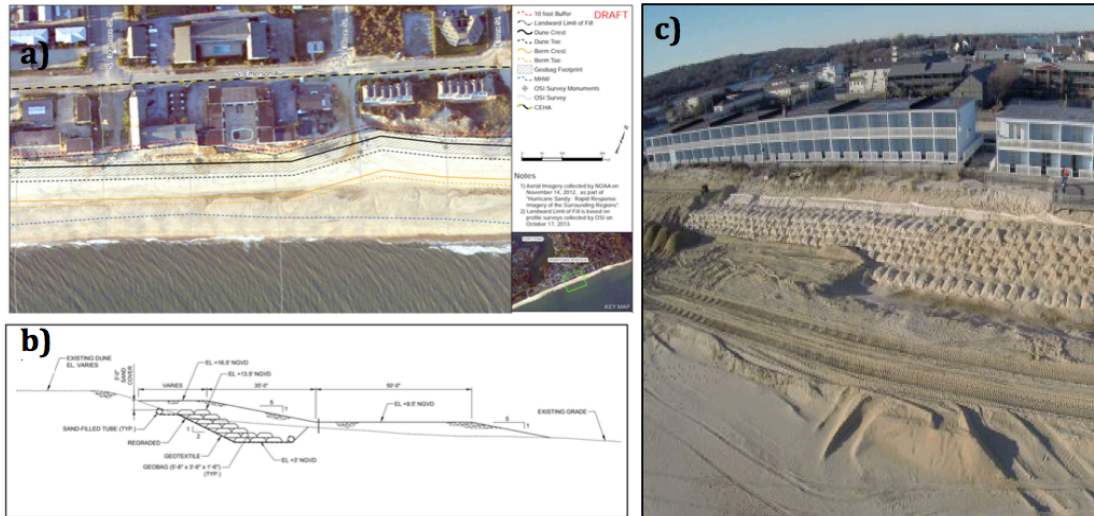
Project Details. a) and b) Typical plan and cross section of the As-built drawings respectively (USACE-NAN, 2014). c) Aerial photography taken during construction of the project (Photo credit by TenCate).
